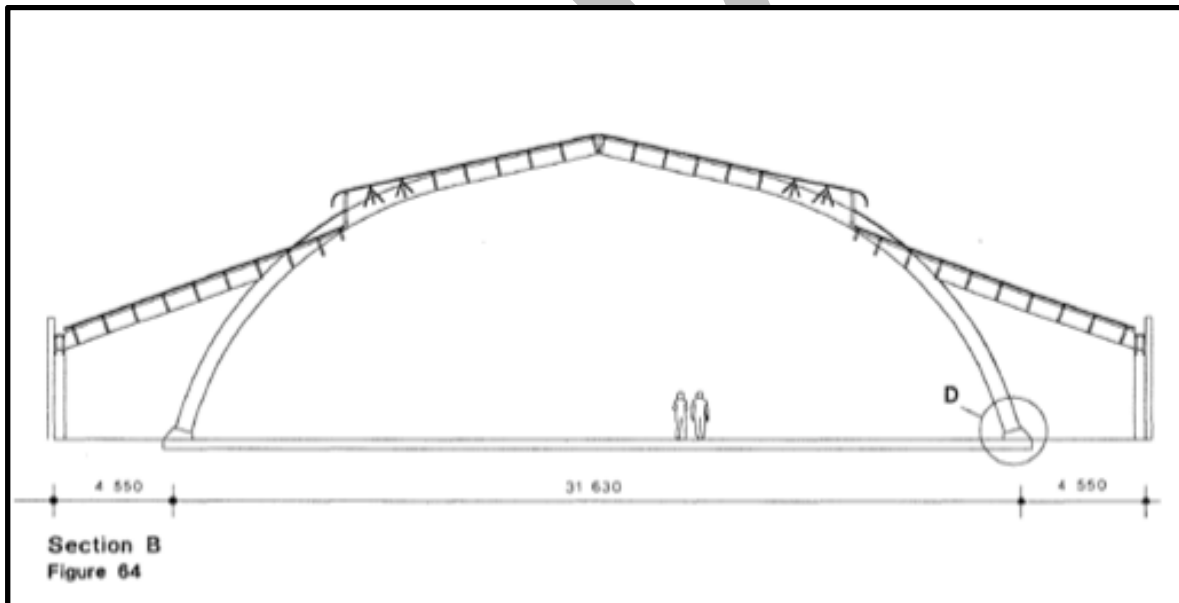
Rudders Bond Store Section B (Source: Nolan, 1994)<sup>13</sup>
